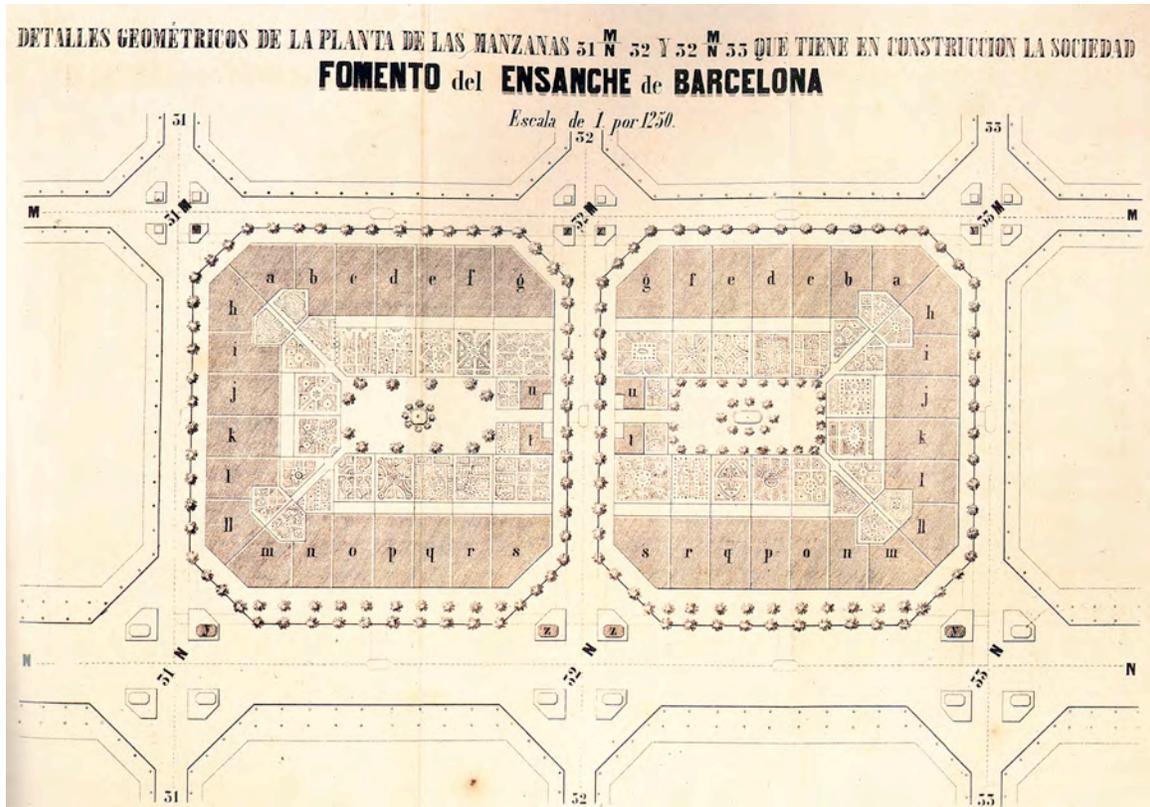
Geometric Details of Block Plans / Detalles Geométricos de la Planta de las Manzanas* by Idelfons Cerdá, 1859.
